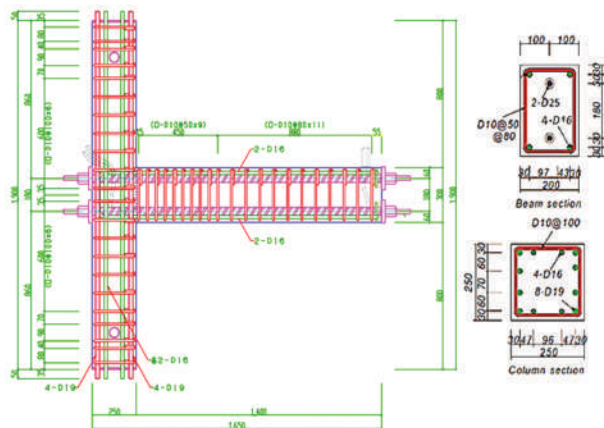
Sectional detail, and reinforcement layout for partially prestressed concrete exterior beam-column joint
